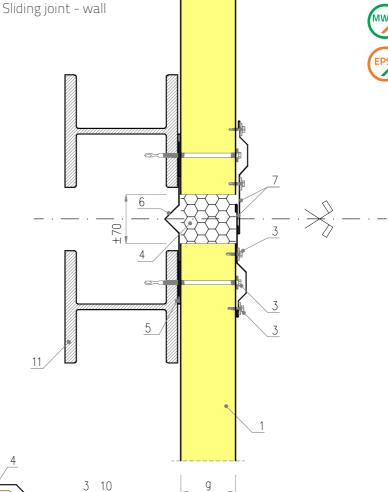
IzoWall, IzoRoof PIR/PIR+; MWF; EPS - sliding joint
